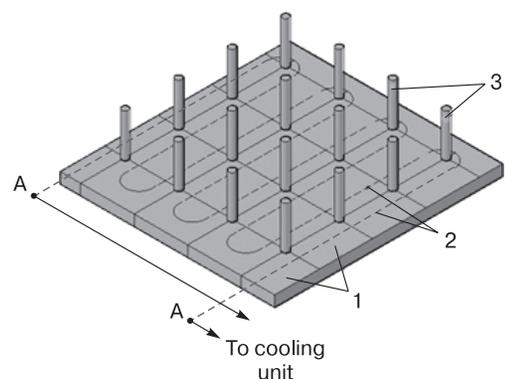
Layout of elements of the cooling system in the underfloor space of the building (above-foundation structures are not shown).
